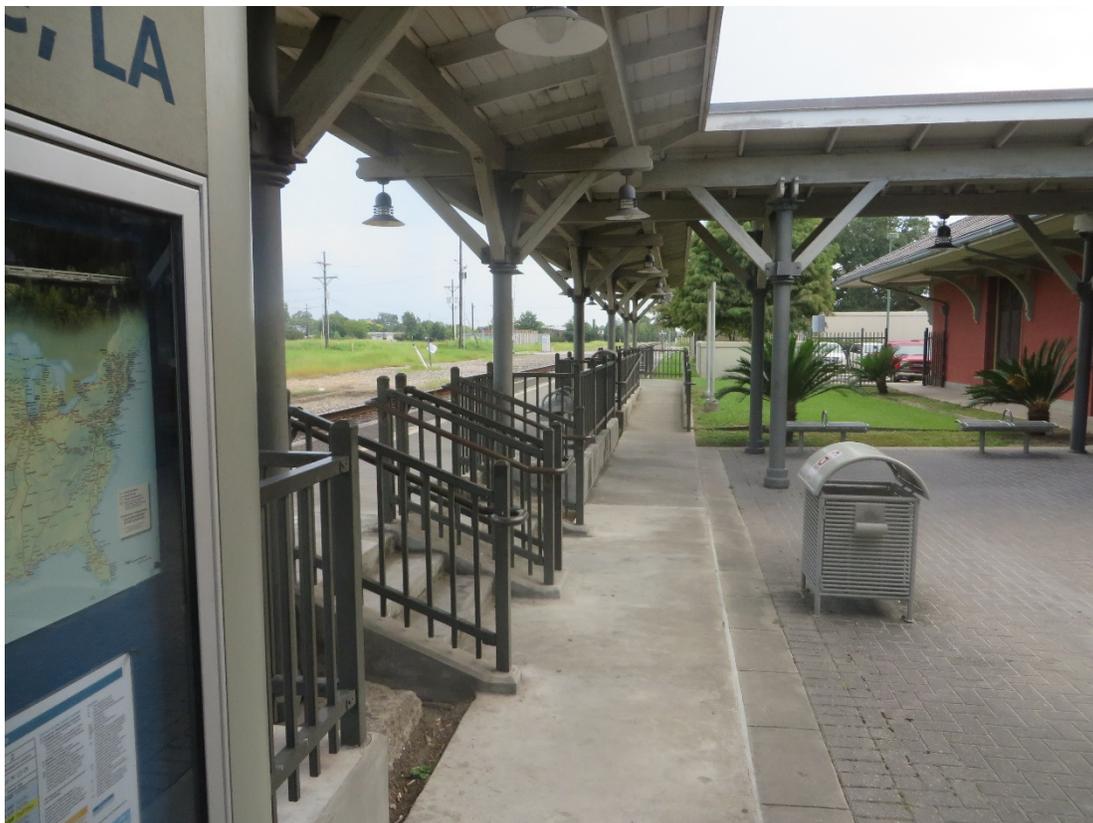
Platform canopy, lighting, access, waiting area, and covered walkways between building and platform (looking southeast).
